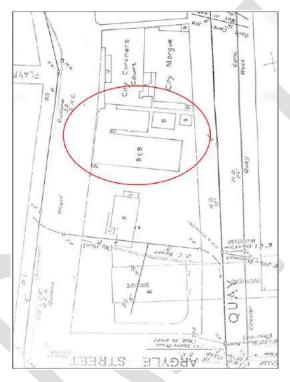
1962 Sydney Water Plan indicating the size of the Sydney Cover Terminal (at right) and showing the overhead bridge that extended over the Circular Quay West roadway to the area south of Cadman's Cottage. The plan is also interesting in that it shows the footprint of the building and two brick lavatory buildings. (Source: Sydney Water, SRS 3768 Base)
